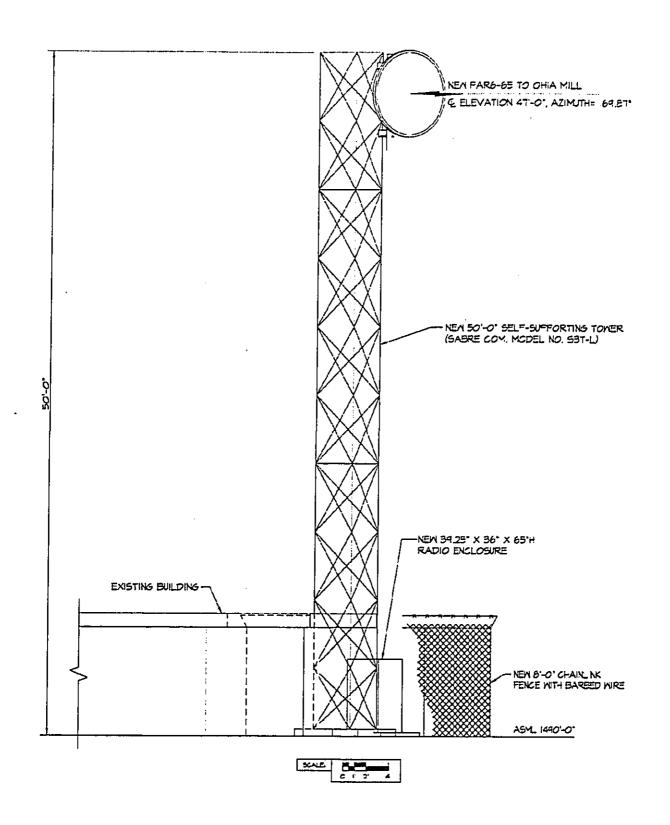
E Captain Cook Police Station / Elevation Plan (looking north)
